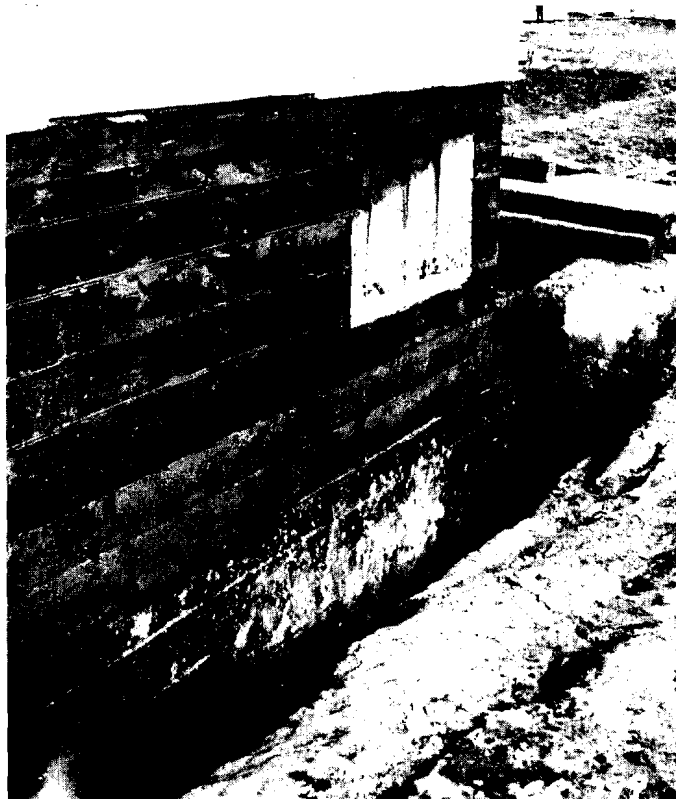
View of Hospital basement taken on August 11 1950 during construction showing complete section of wall with tarpaper, wood sheathing and pitch applied over the 6- by 6-in. posts
